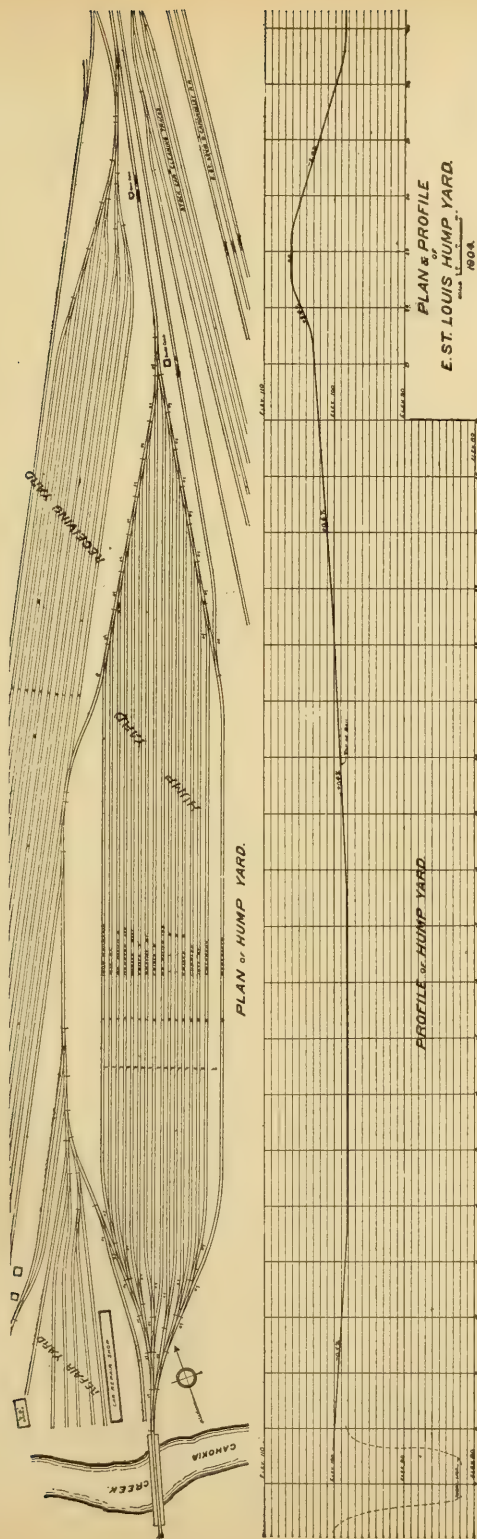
HUMP YARD, PLAN AND PROFILE.
